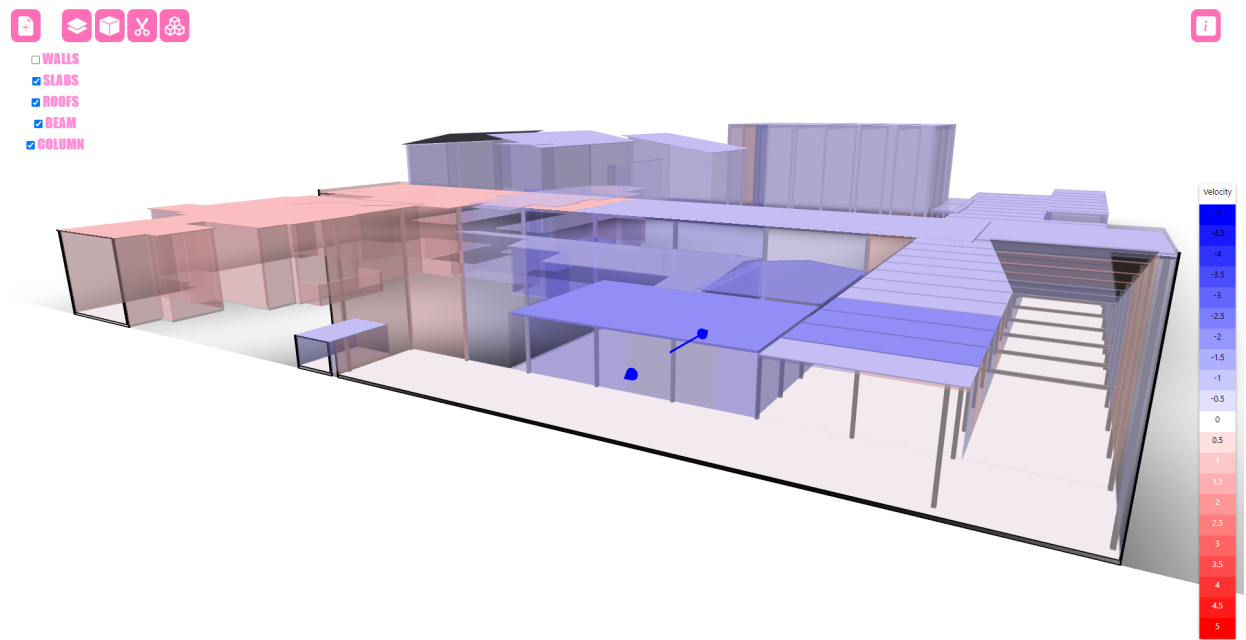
A web portal to visualize an IFC file with monitoring data from PSI. Single structural elements, like walls, beams, slabs, and parts of the roof are color coded with their LOS velocity. The tools allow section views and filter by element type to show otherwise hidden parts.
